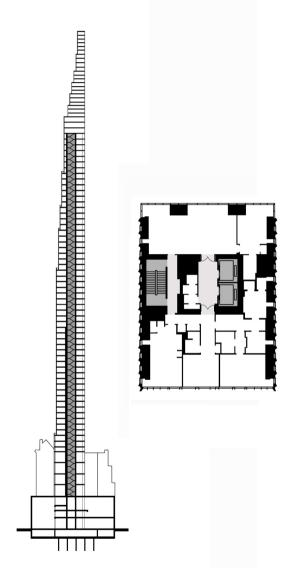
111 West 57th Street: plan and section (developed by authors based on [44])
